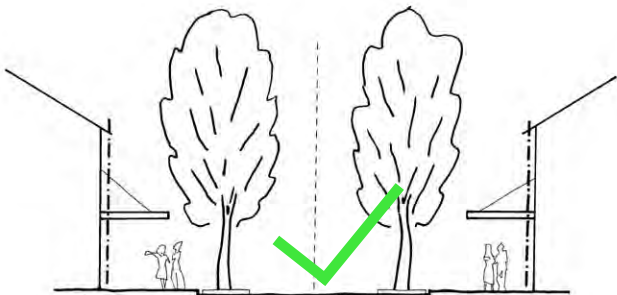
Typical street section with buildings and awnings on both verges and fastigiate street trees planted in-road. A limited number of street trees planted in strategic locations would have a significant impact on the appearance of the street.
